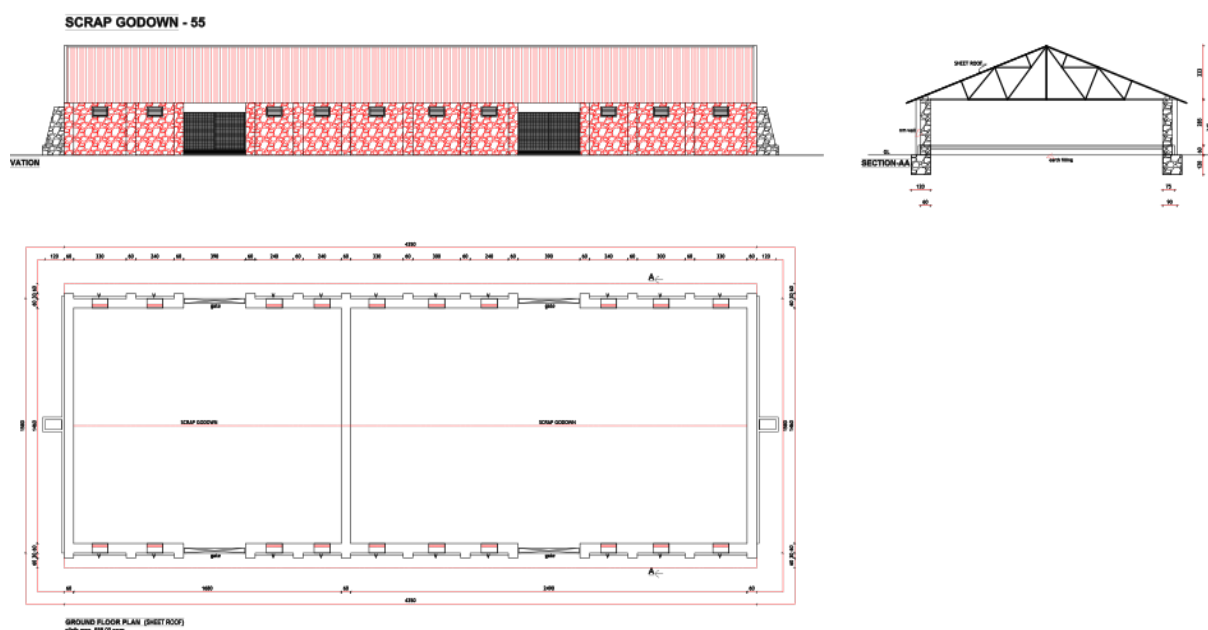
Proposed Space Layout for Pilot Production Facility at TTPL: Building 1
